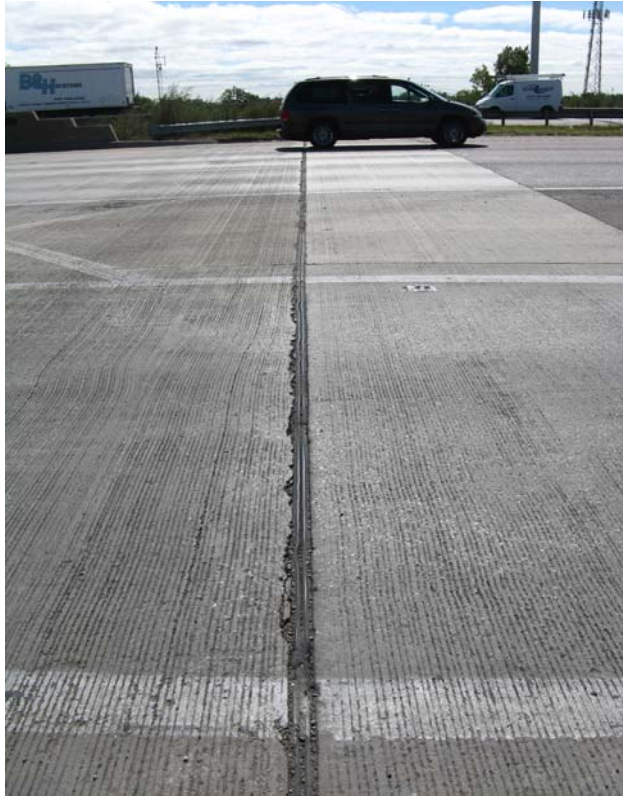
Typical joint at approach slab (West Approach shown), looking south
